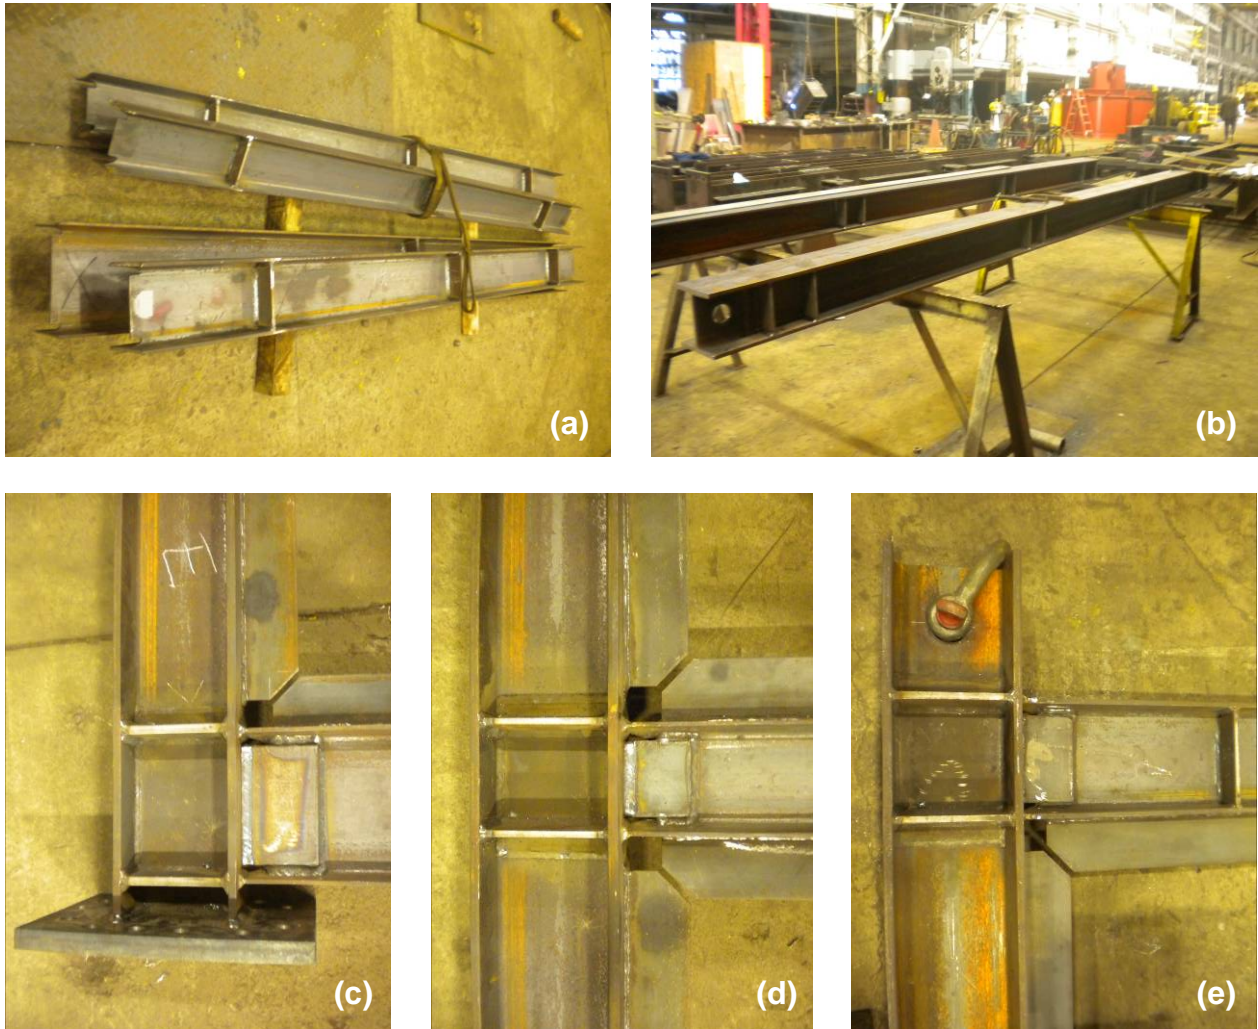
Fabrication Process of Boundary Frame: (a) HBE components; (b) VBE components; (c) Bottom Joint Assembly; (d) Intermediate Joint Assembly; (e) Top Joint Assembly
